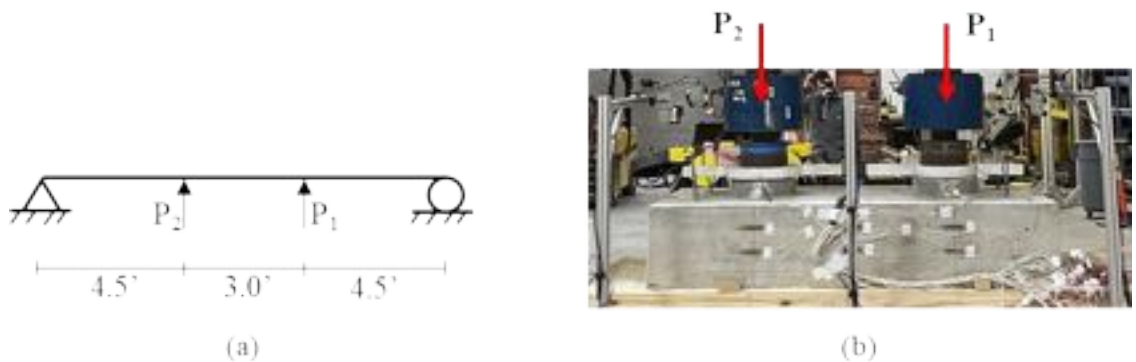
(a) Assumed loading and boundary conditions for load frame and (b) side view of specimen during testing for the multi-plug test specimens
